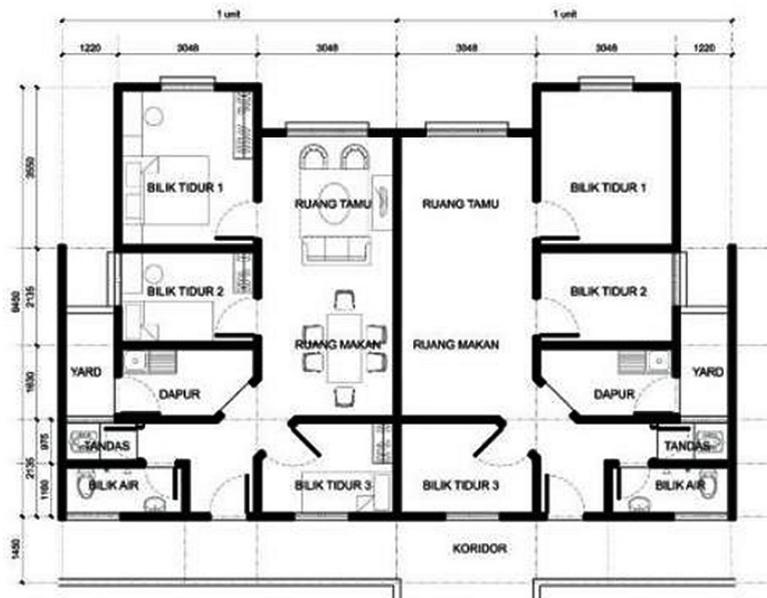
Standard unit layout plan for low-cost flat (Goh & Yahaya 2011)
